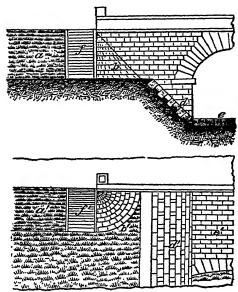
C —Plan and elevation showing a method of arranging the embankments where there are no wing-walls.
